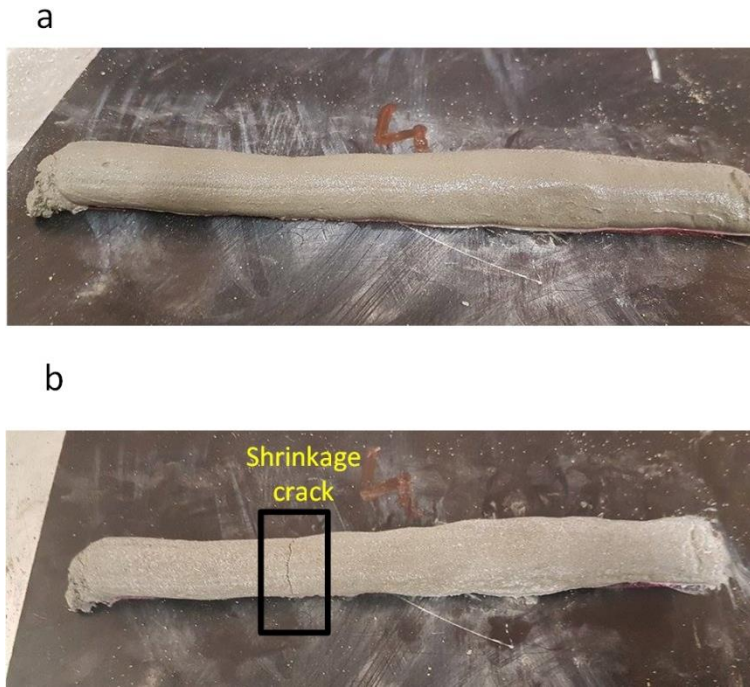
(a) The printed part immediately after printing; (b) The printed part after one-day drying.
